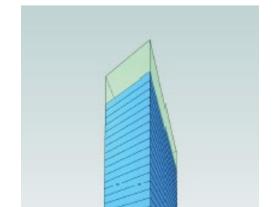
3D View of the Proposed Building Envelope Looking North East
